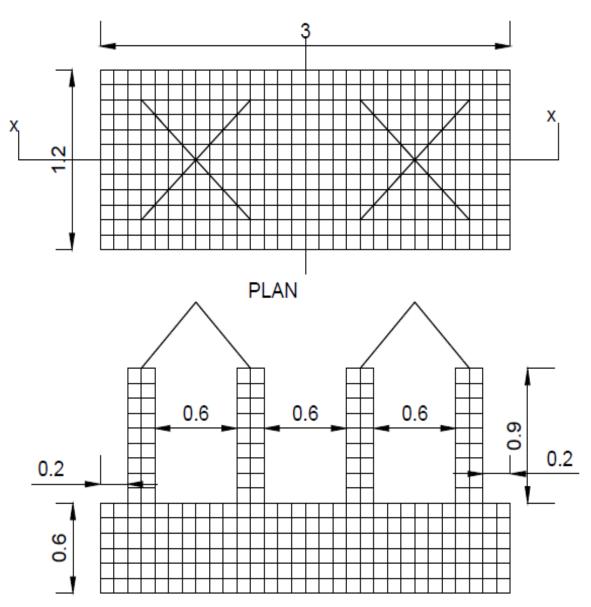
Plan and Sectional Elevation of Table Mounted Block Foundation
